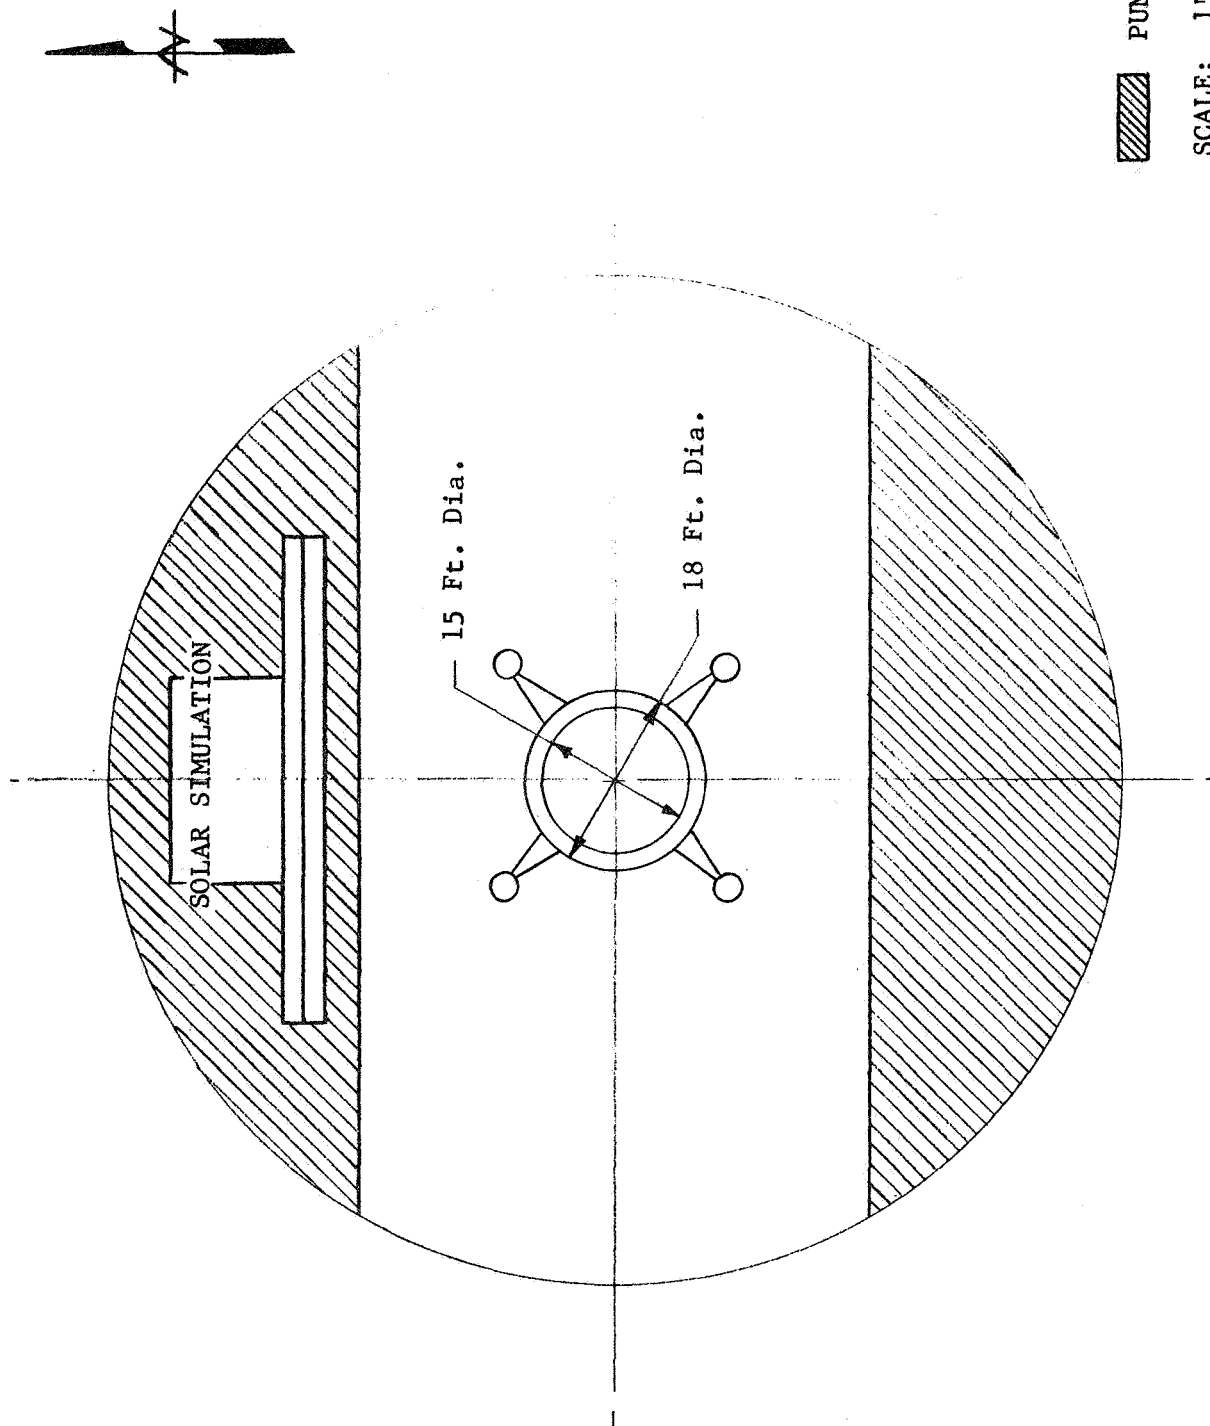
SPACE PROPULSION FACILITY WORKING ENVELOPE
